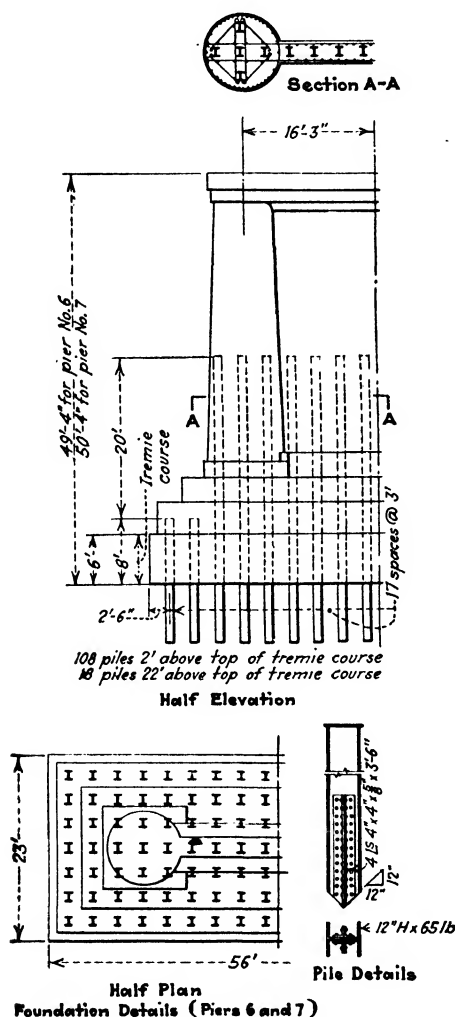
Steel H-piling Foundation for Pier of Bridge over Kansas River in Kansas City.
